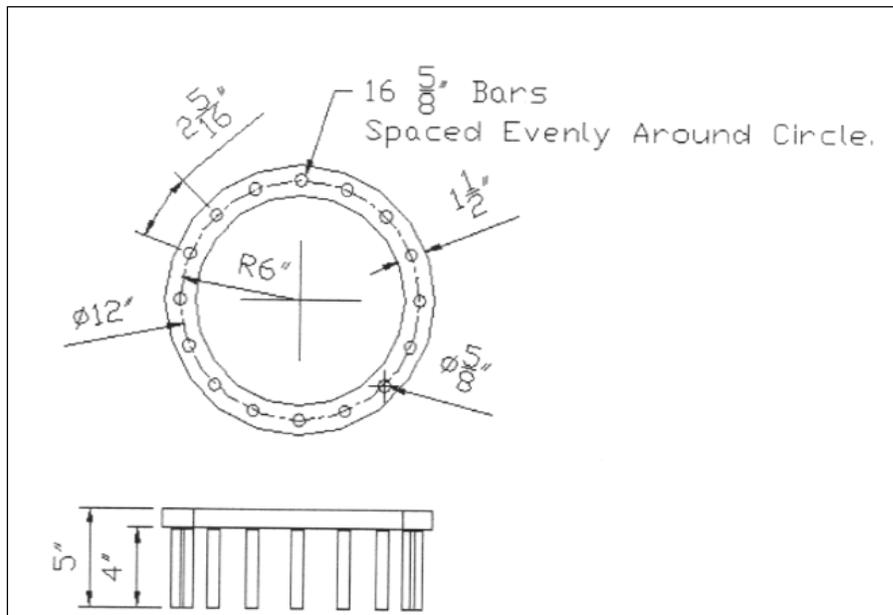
J-Ring Testing Apparatus (ASTM J-Ring Draft 2004)
